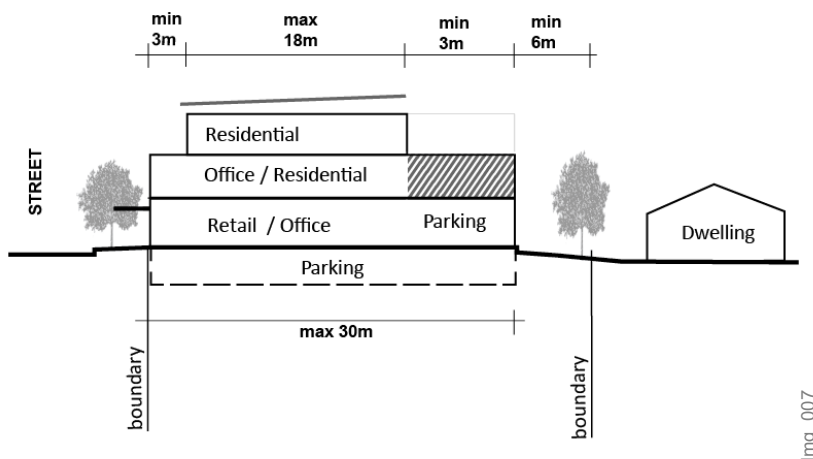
Building setbacks and building depth for development in E1 and E2 zones
